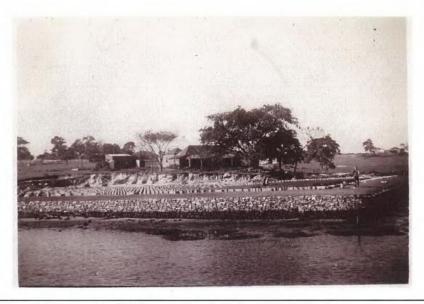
Construction of Halvorsens boatshed circa 1939/40. Sandstone was excavated to provide a level foundation and dressed blocks were placed in the seawall. The original house and outbuildings in the rear were demolished soon after this photo was taken. Note that the depth of the foundation cut at the rear of the building is probably sufficient to destroy any original building footings. Photo from Randi Svensen collection held by the National Maritime Museum, Darling Harbour.
